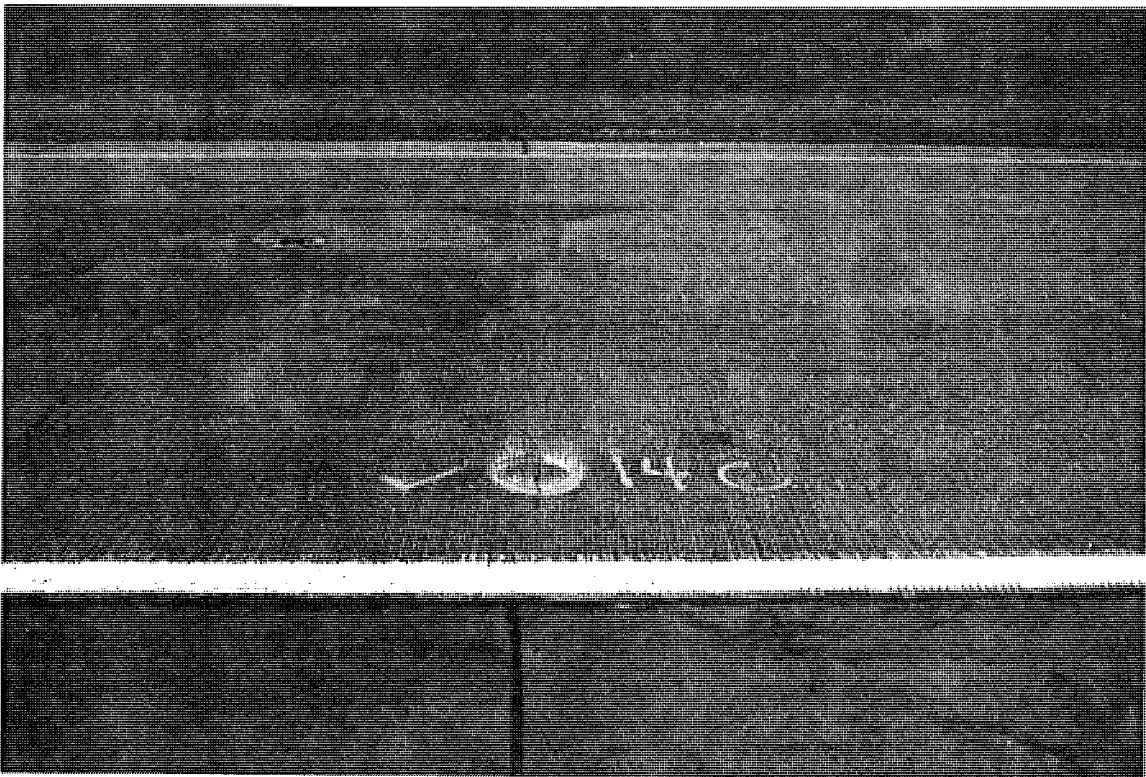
A typical transverse crack on CSN# 77024-17988A, (Section B), EB. Showing the location of core 14.
